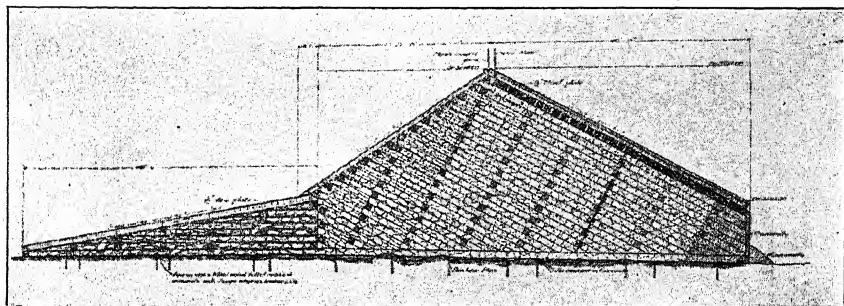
CROSS-SECTION OF DAM AT RAINBOW PLANT.
